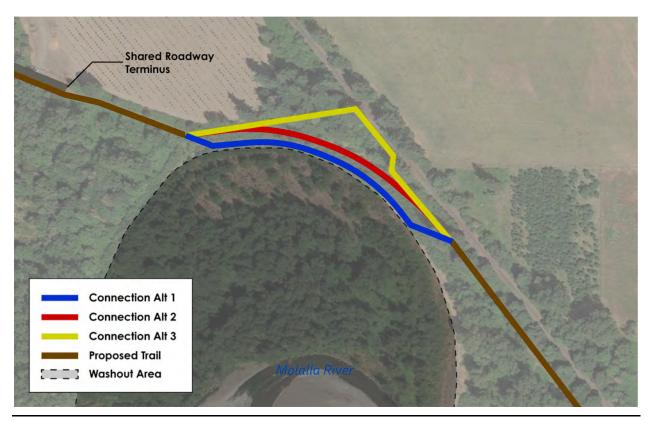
Connection Alternatives for Rebuilding Washed-Out MFR
